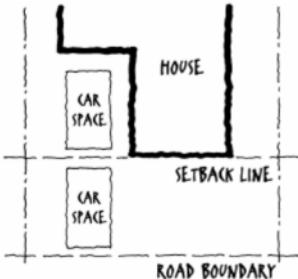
D Corner Lot Nominated Road Frontage Setback
